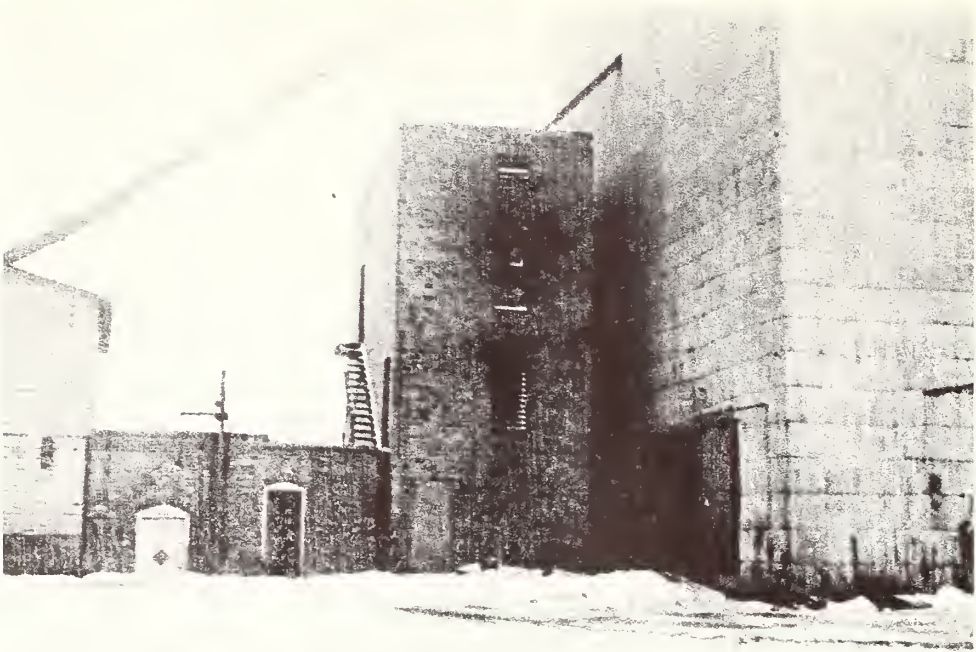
Noninflammable masonry construction, built around a grain drier located adjacent to main elevator building.
